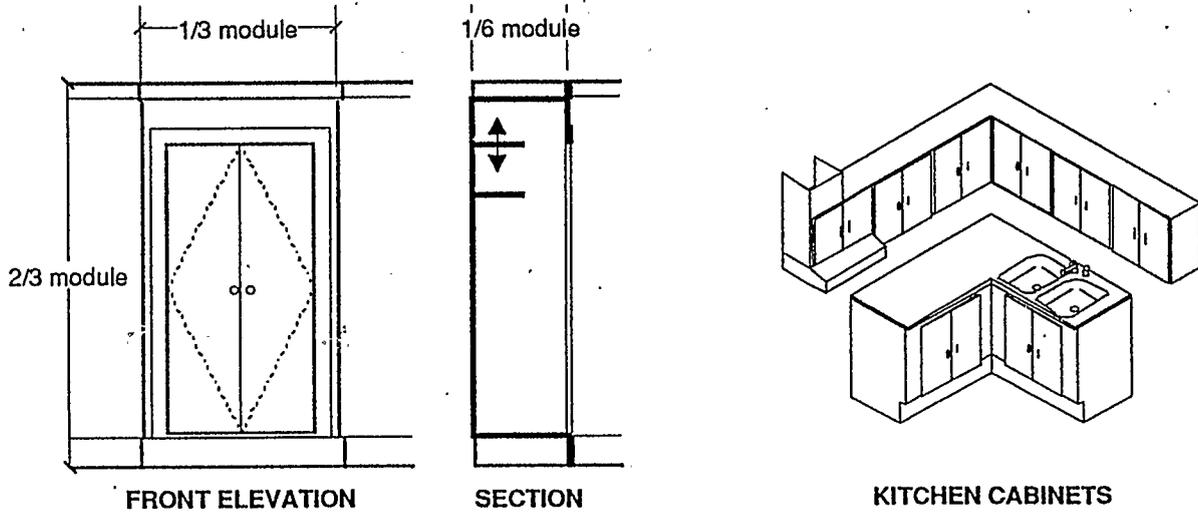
Examples of cabinetry: elevation and section of typical closet; and isometric of cupboards for a small kitchen
